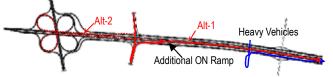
Recommended Modification of the LHLE Connection Plan (Outflow)
